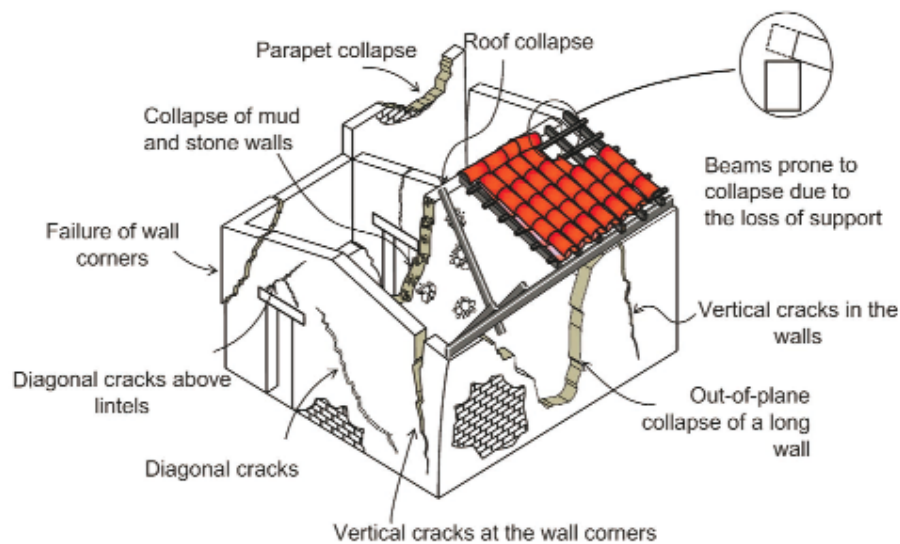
Examples of typical failure modes for nonengineered masonry dwellings (Blondet)
